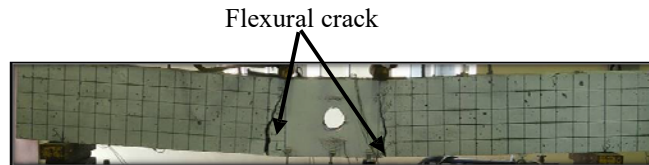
Shear failure of Beam 5 at load 30.69kN.
